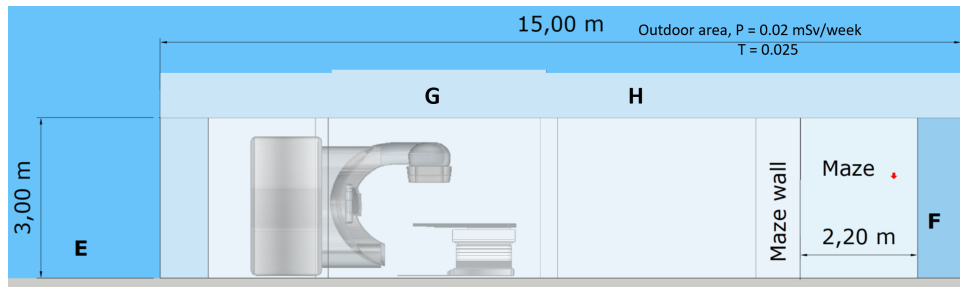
Room layout and labels used for primary (G), secondary barriers (E, F, H) and maze wall (front view).
